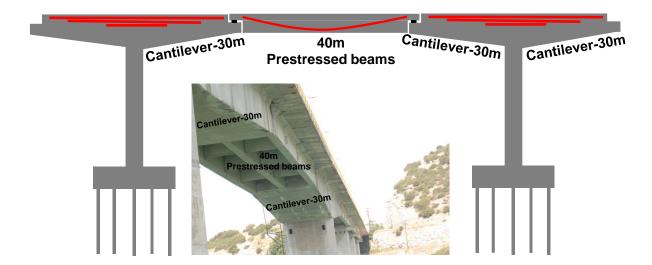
Schematic (not true) configuration with prestressing cables (red lines) and the actual view of the deck between Piers 23-24.
